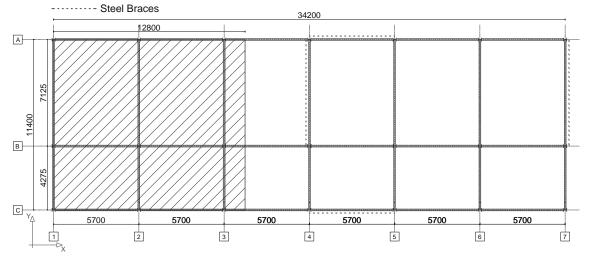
Floor Framing Plan - Asymmetric Configuration (dimensions in mm).
